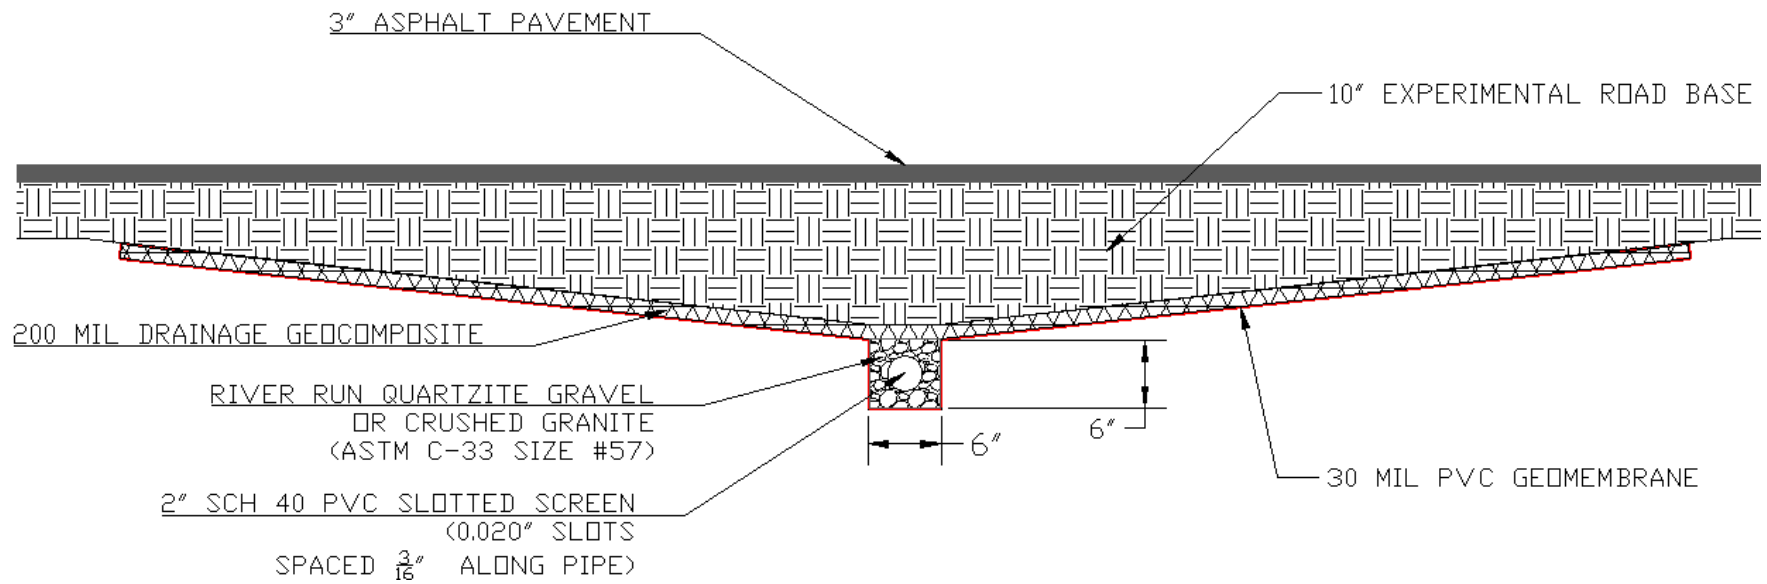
Cross section of a lysimeter, marked in Figure 2-3 as “Section B.” The lysimeter collects infiltration through into a 6in-by-6in trench, containing a 2in PVC pipe with slots surrounded by gravel. Drainage geocomposite facilitates the flow of water into the trench. The geomembrane acts as an impermeable layer in the collection system, preventing infiltration from traveling past the base layer.
